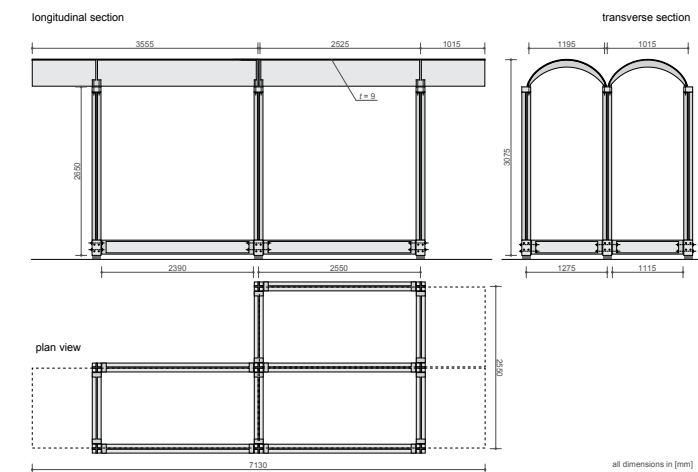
Dimensions of 1st prototype unit, 2019
